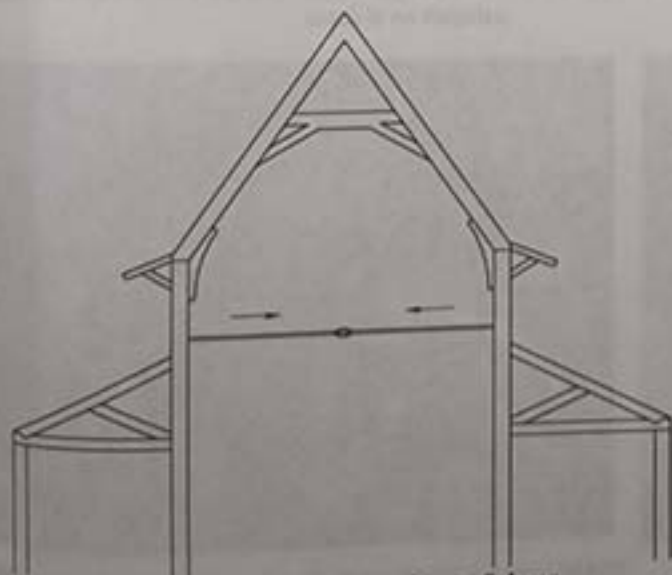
Vaulted Center Roof with flanking Lower Roofs. Horizontal Ties connecting to columns.
